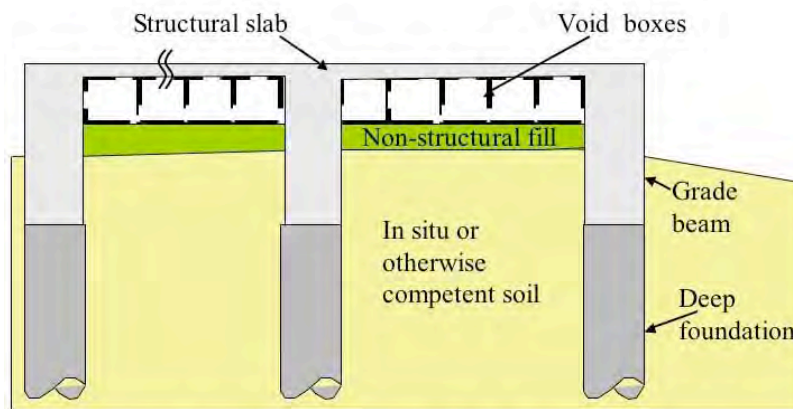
Structural Slab with Void Space and Deep Foundations
